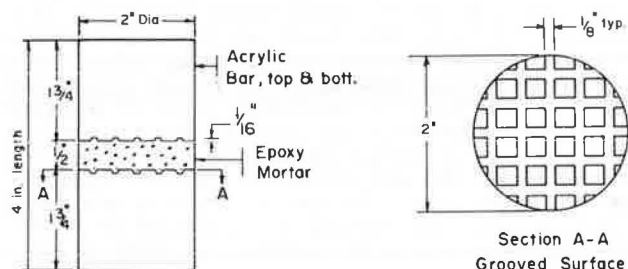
Sandwich cylinder specimen for fatigue testing.
